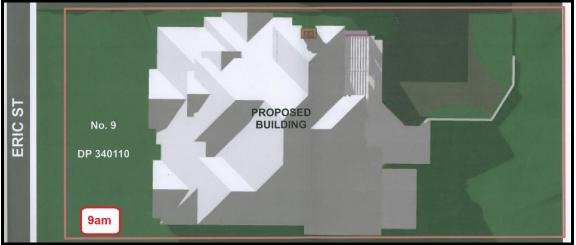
Image showing the shadow diagram of 9 Eric Street, Eastwood at 9am. The submitted shadow diagram indicates that there will be some shadow cast over the rear private open space of the development, by the development itself.
